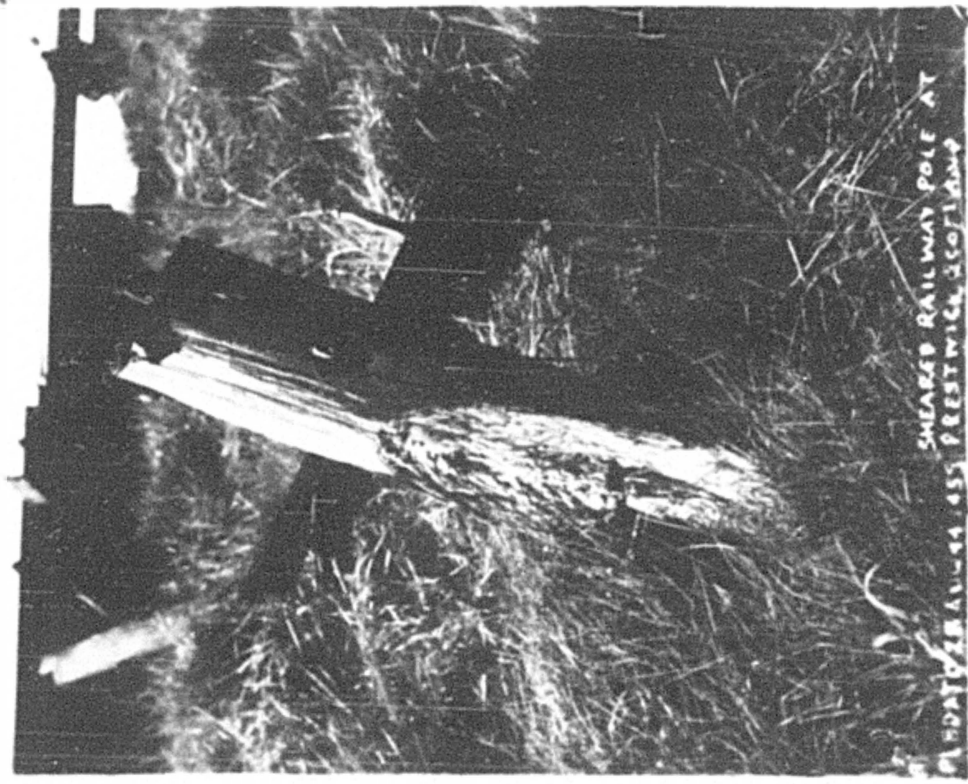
AUG 44 1455 SHEARED RAILWAY POLE AT
